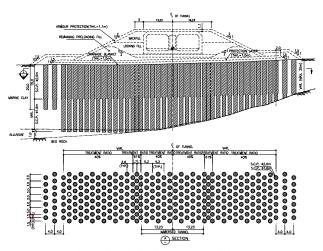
Typical SCP foundation layout at tunnel elements E15 to E17.
